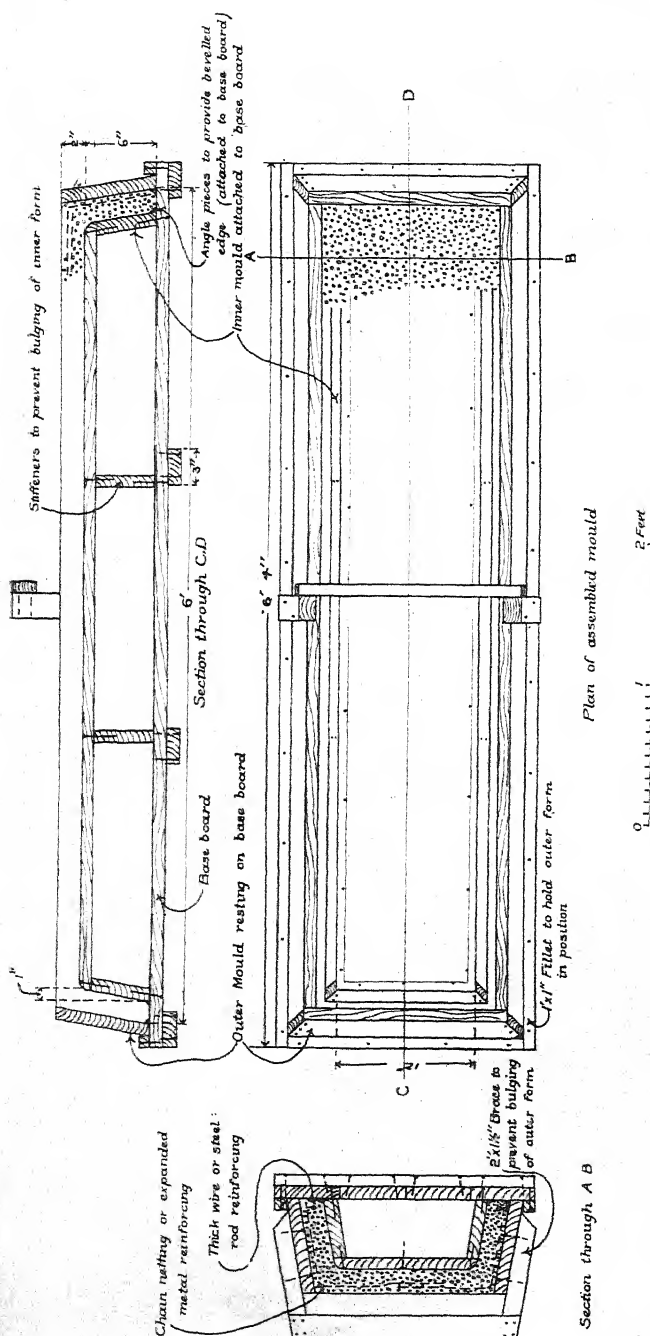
DRAWINGS OF MOULD FOR PIG-FEEDING TROUGH.
